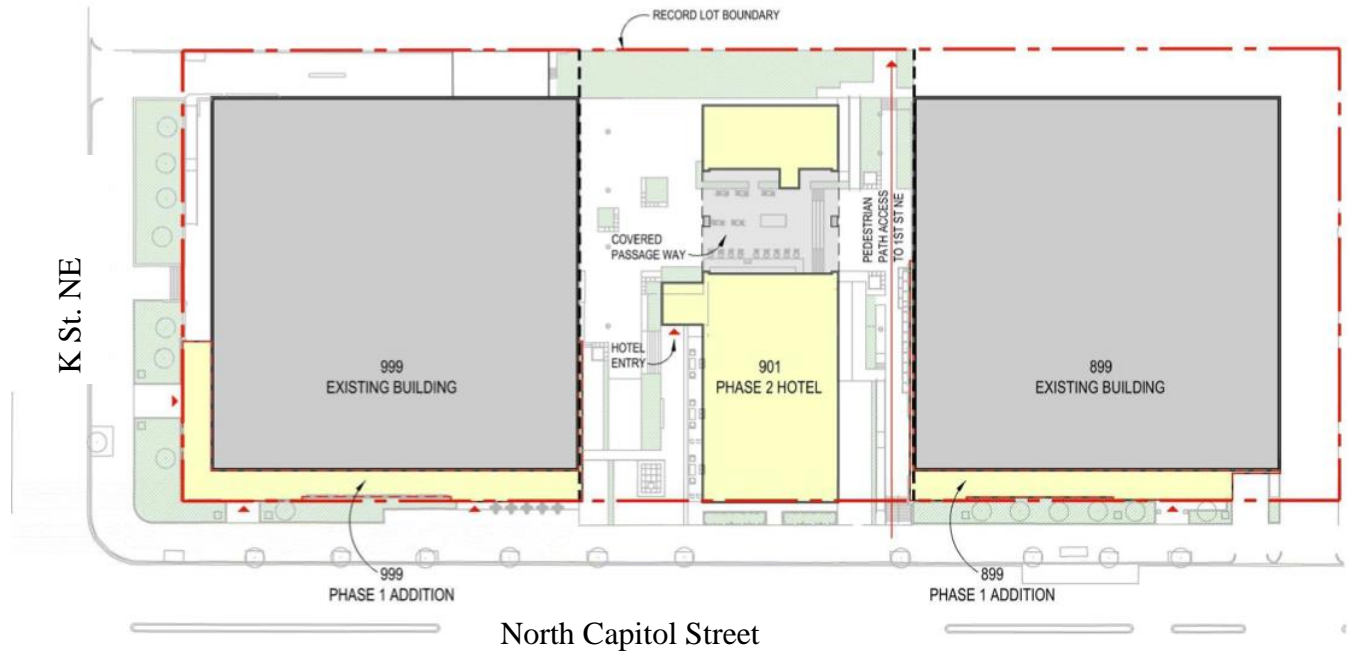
Phases 1 and 2 Site Plan. Areas in Yellow are New Construction.
